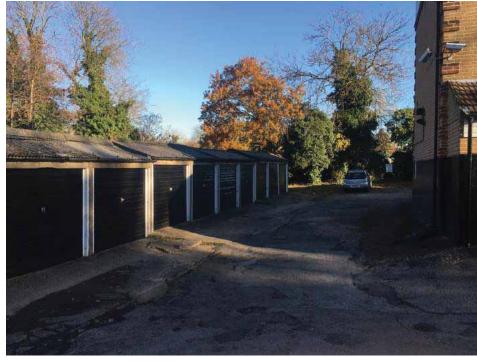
VIEW 5 EXISTING GARAGE LOOKING NORTH EAST
